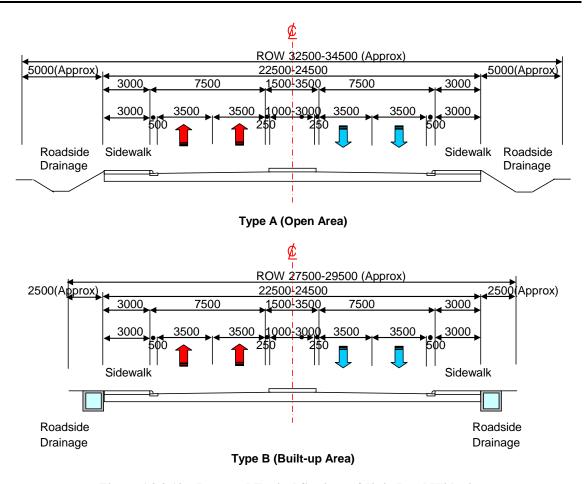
Proposed Typical Sections of Jinja Road Widening
